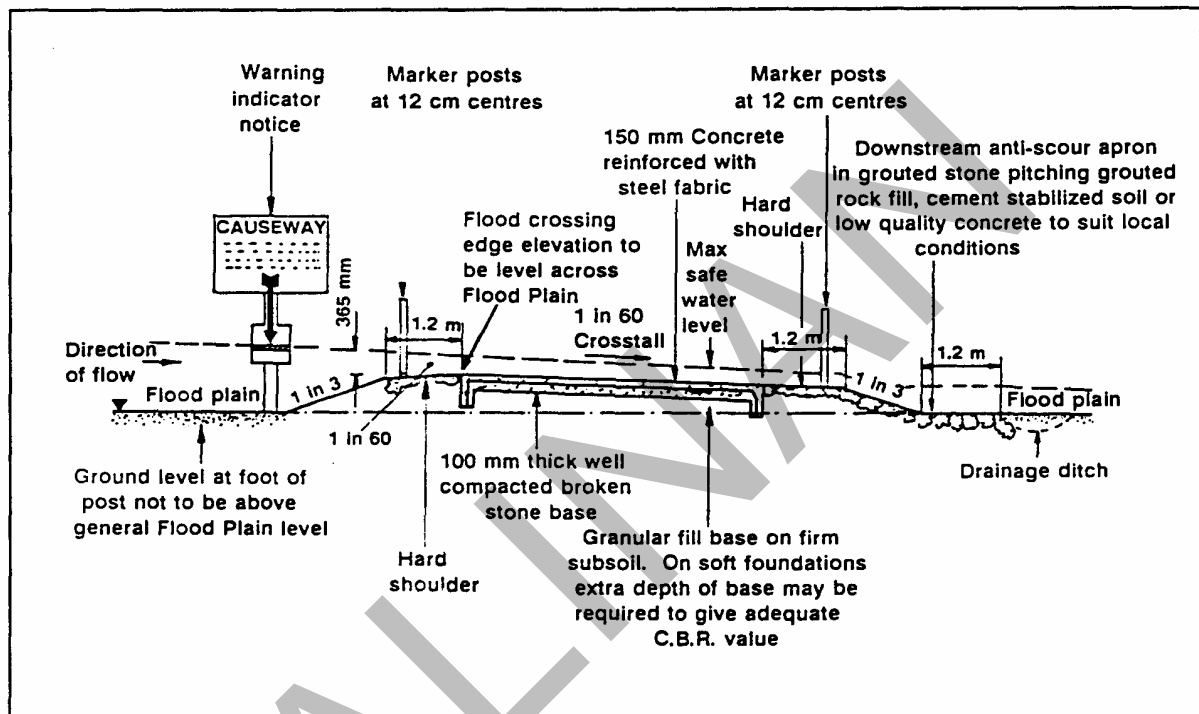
Cross-Section of Typical Flood-Crossing
